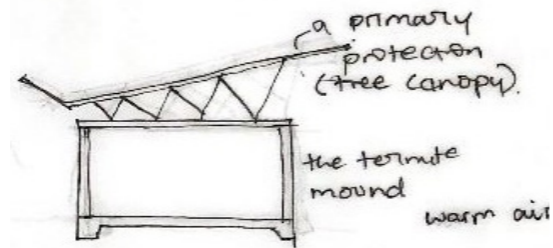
Sketch of the building structure showing a double roof system that mimics the tree canopy with large overhangs to protect the clay walls (Author 2021).
